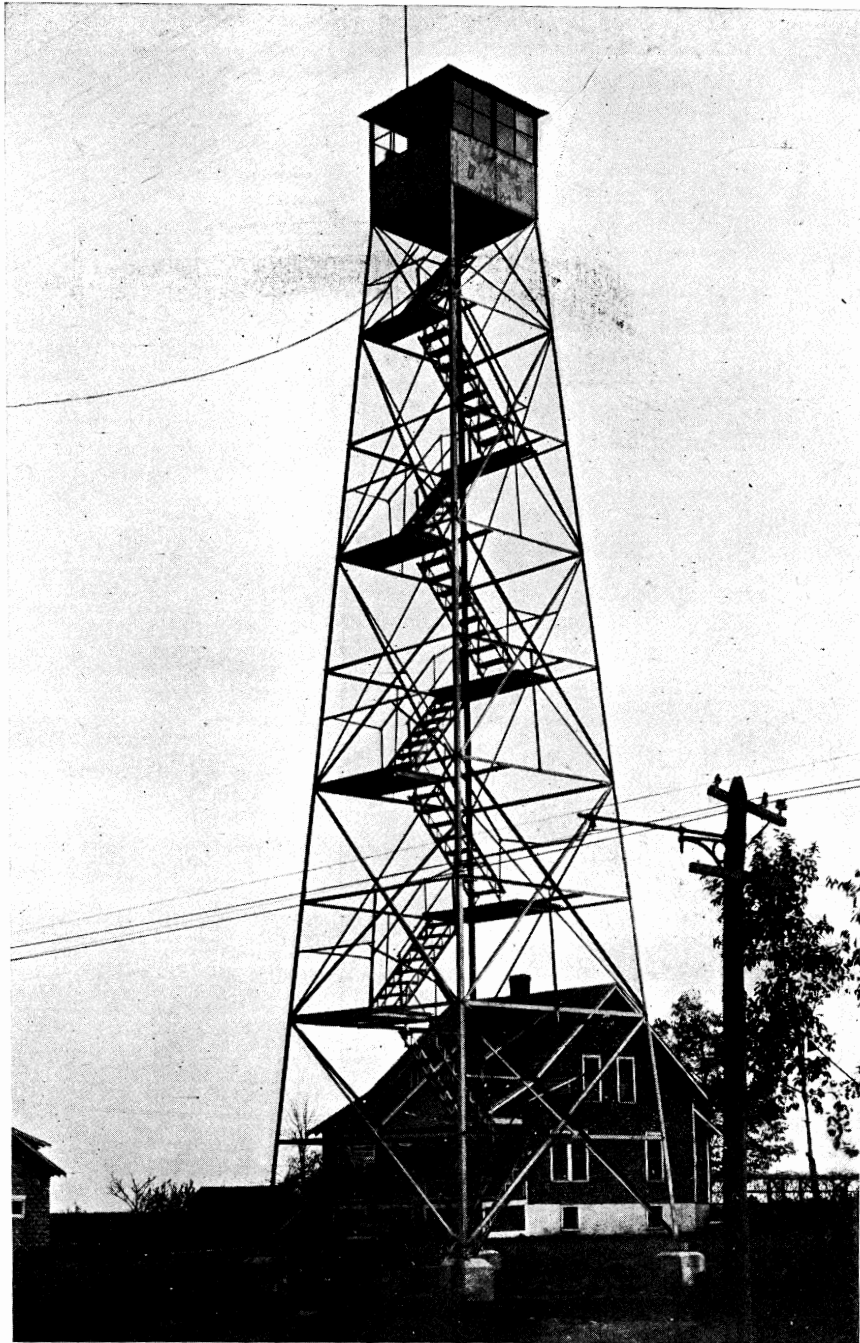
NEW MILLVILLE FOREST FIRE LOOKOUT TOWER
